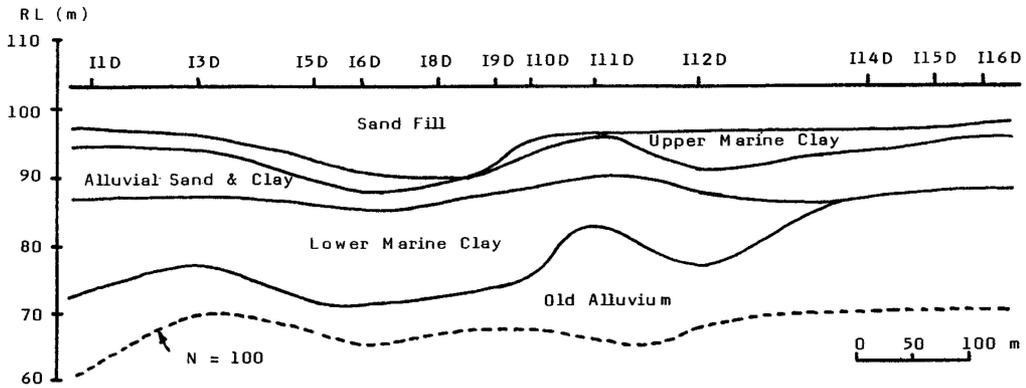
Soil profile along the perimeter of excavation from south to north (Section A-A').
